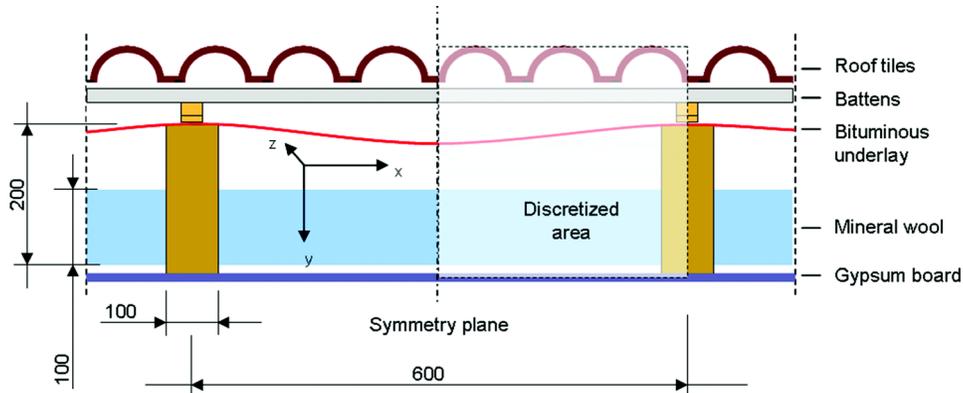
Typical vented roof construction and discretized section in x-y-plane.
